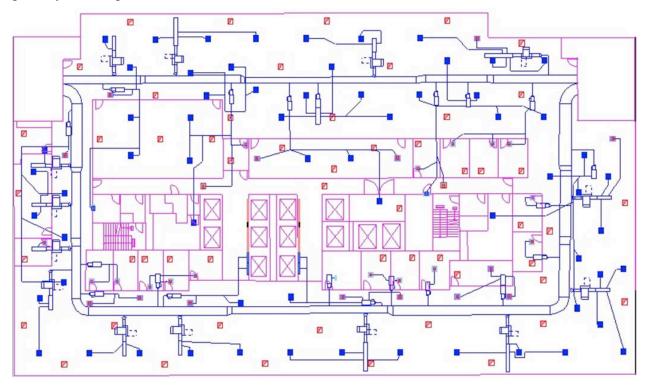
Duct Layout for Intervention Floor (control floor duct layout is similar)
